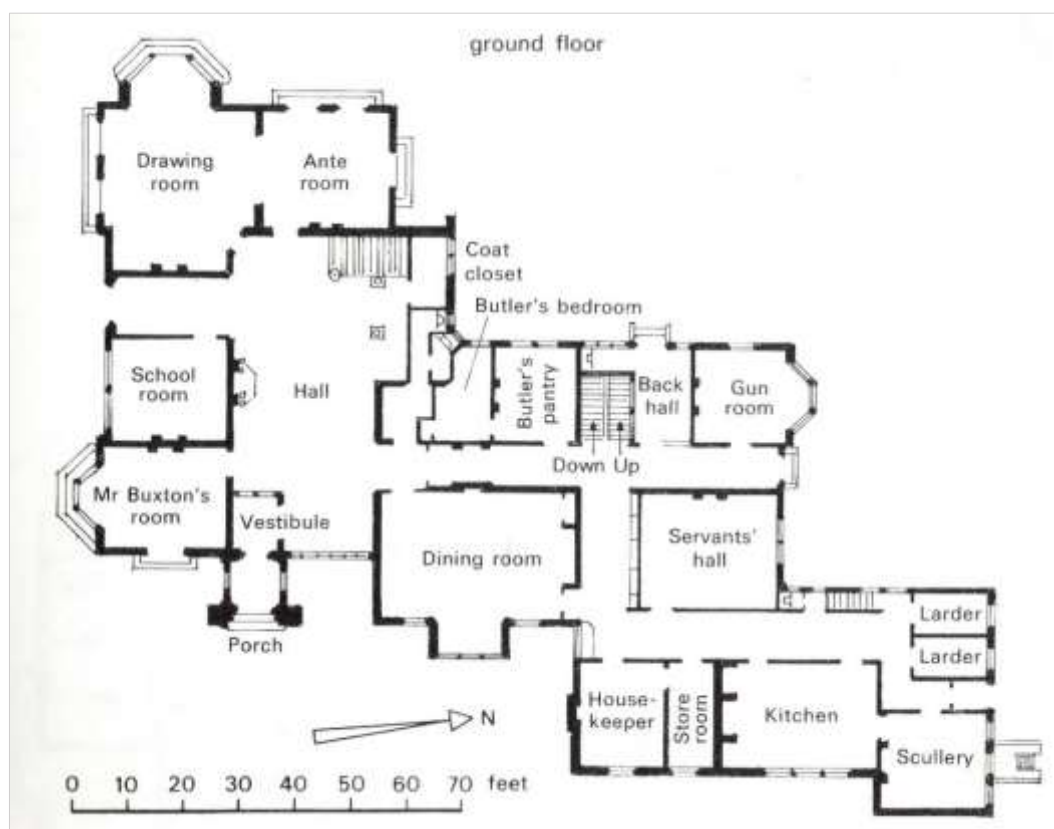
Easneye – ground floor plan (© Jill Franklin)
